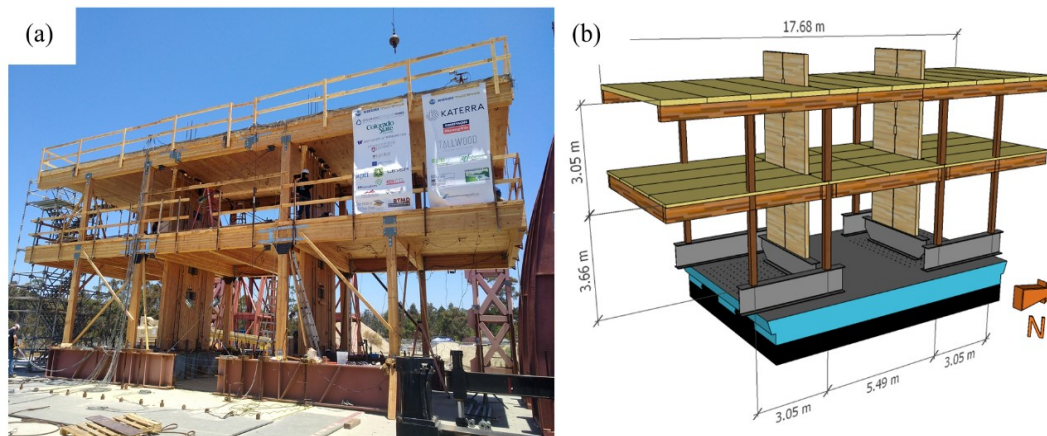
Structural test specimen: (a) Photo (“NHERI TallWood-Home” 2021), (b) 3D rendering with dimensions
